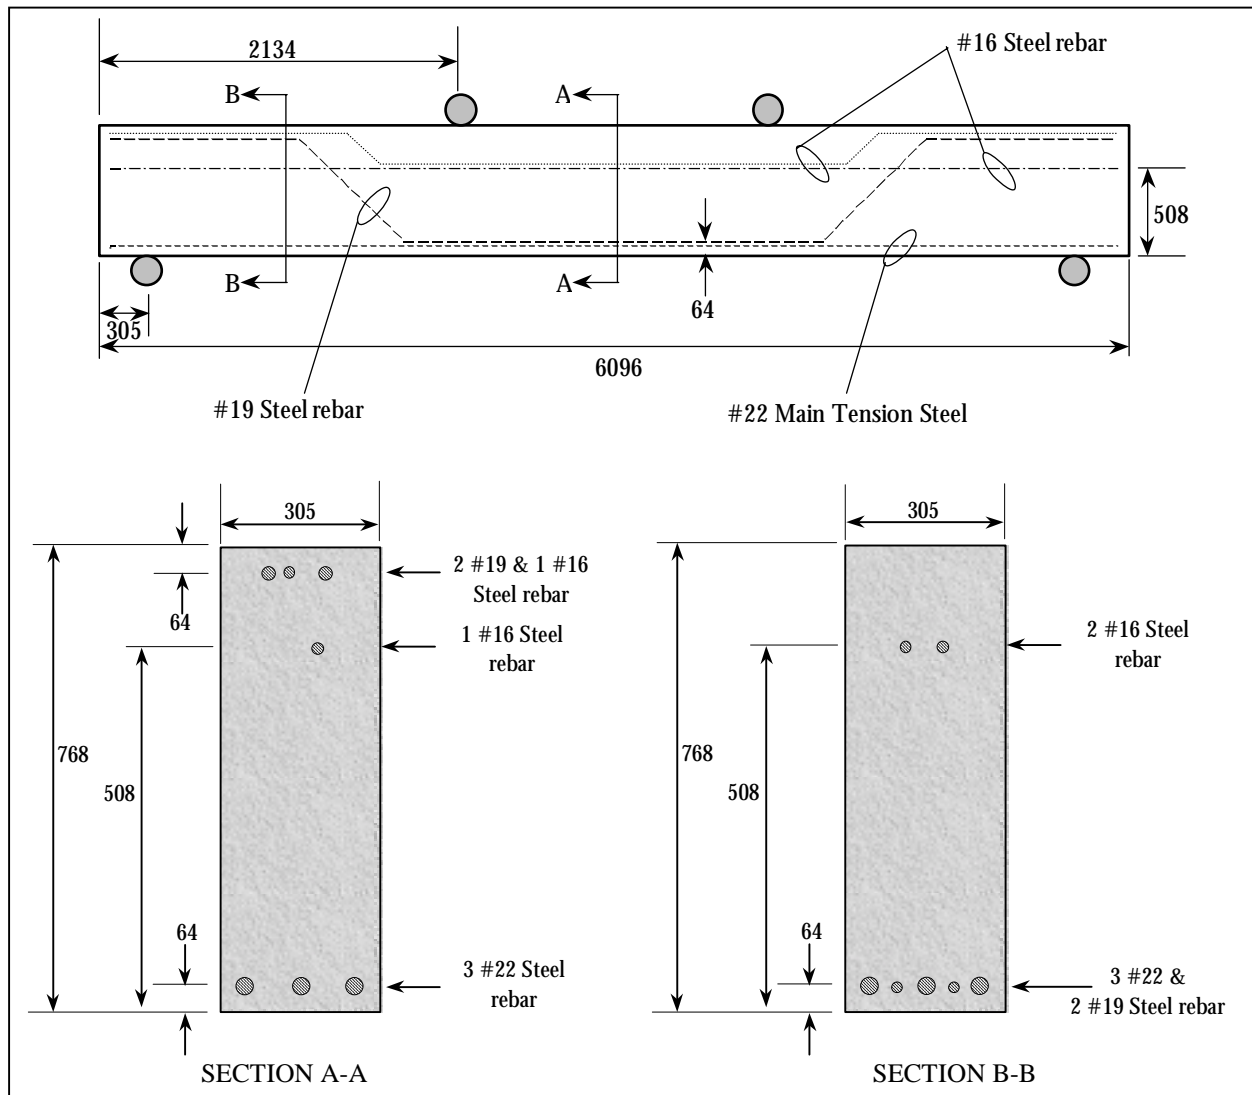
Position of steel reinforcement in all beams. Dimensions and rebar sizes are in mm.
